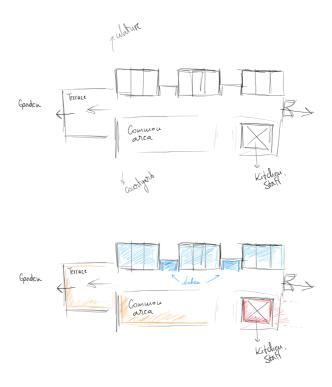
Schematic floor plans of dementia station in Perisutti Pflegezentrum.
